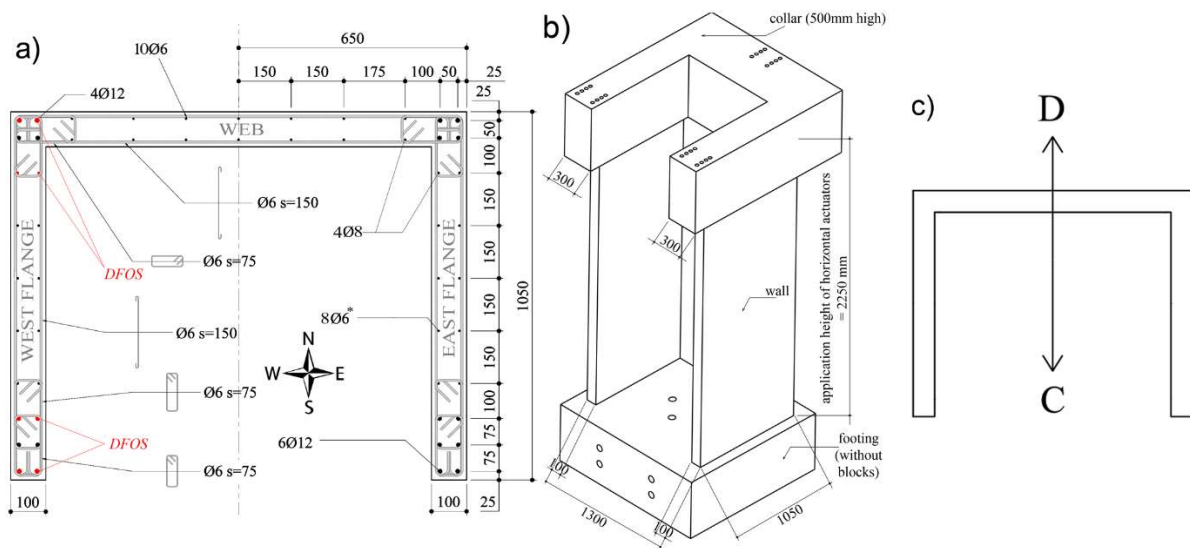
(a) Cross-section and reinforcement detailing of the wall specimens, (b) elevation view, and (c) loading positions of the wall
